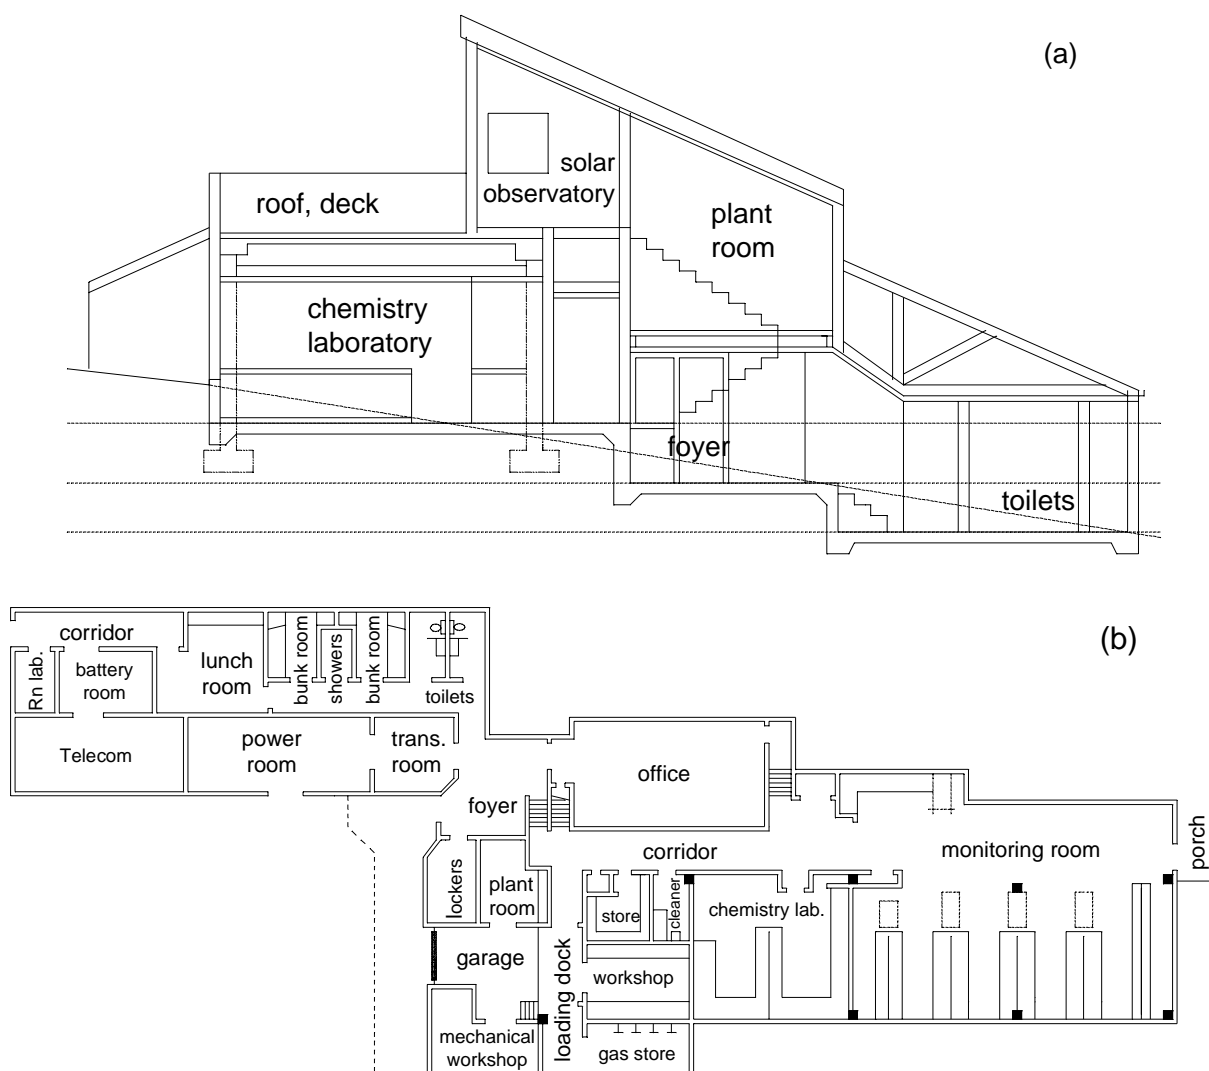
Building plan for the Cape Grim site, (a) the south east elevation (b) the floor plan of the Station.
